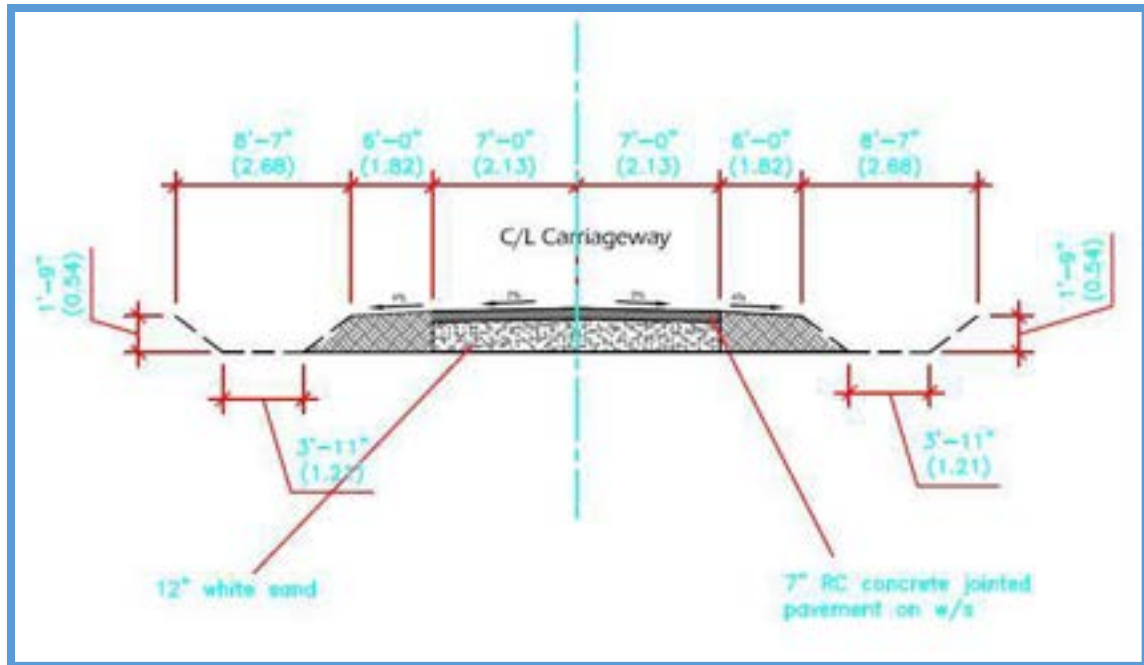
Cross Section of Jointed Reinforced Concrete Pavement on White Sand Link Road
